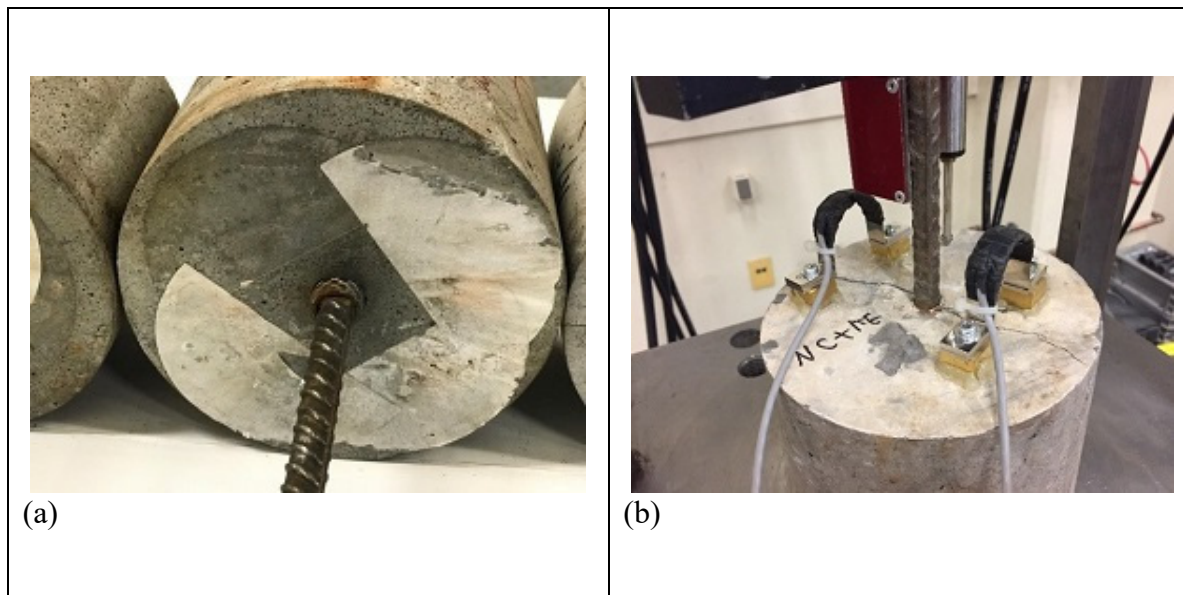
Failure modes for pull-out test specimens: (a) pull-out failure; (b) splitting failure
